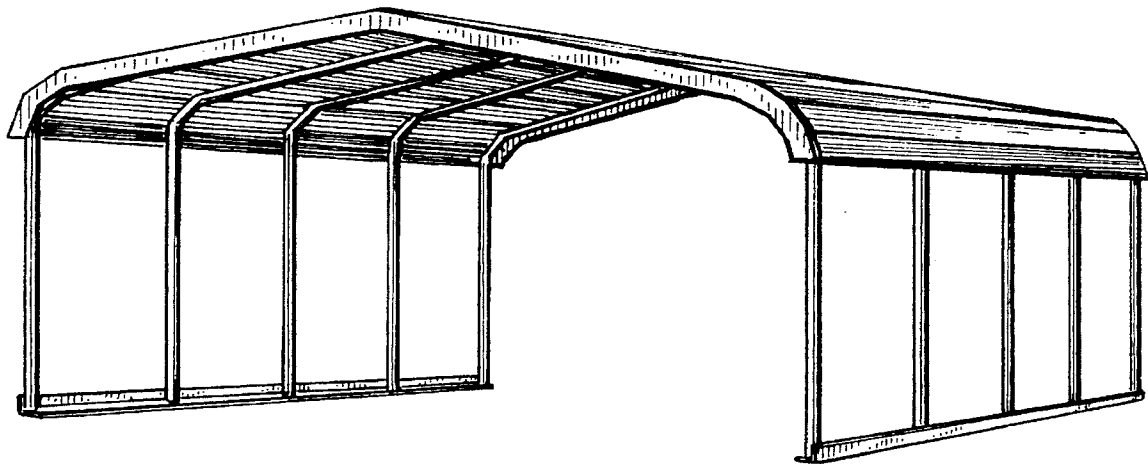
is a front perspective view of a prefabricated shelter showing my new design;
